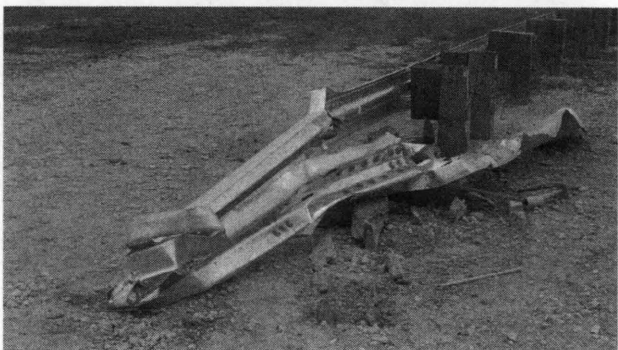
Damaged test vehicle and terminal after large car, end-on test.
